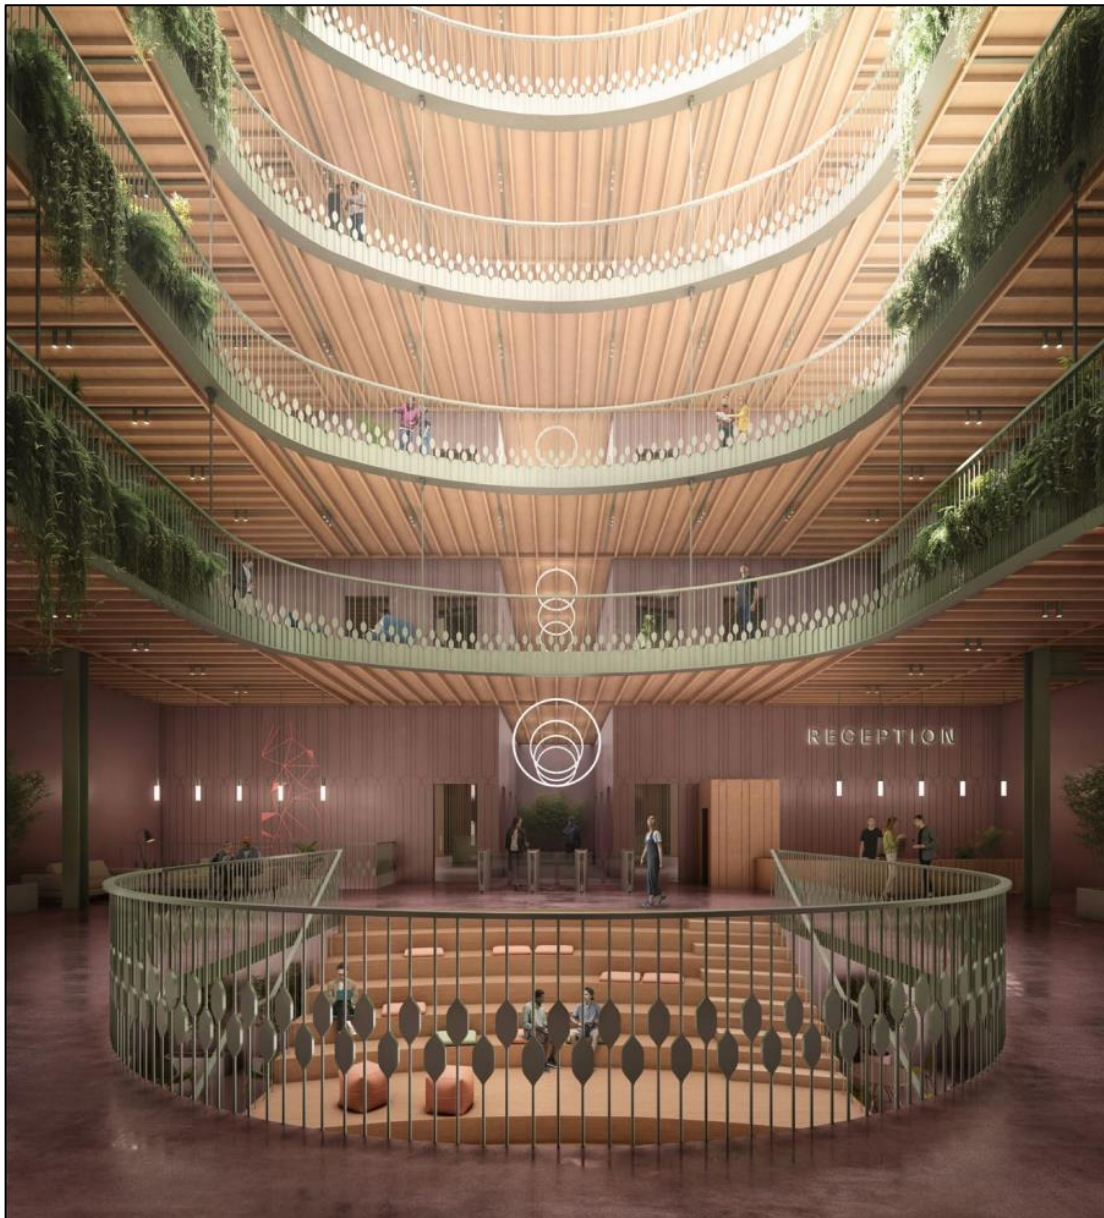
Indicative view of the internal atrium to the centre of the building, at ground floor level
